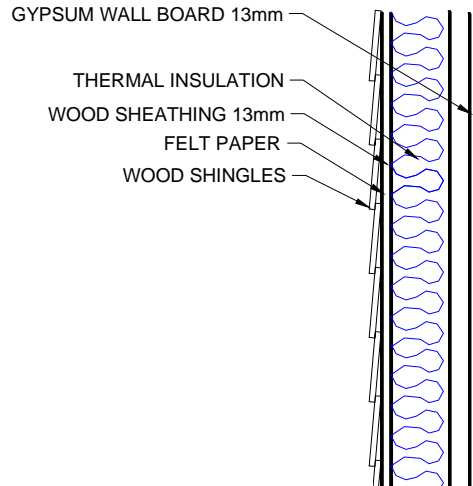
5 ; Typical wall construction at the Beliveau house.
